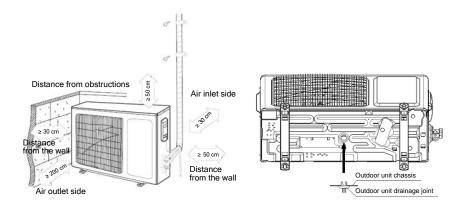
Space requirements for installation Figure 5-3 Drainage pipe connection
